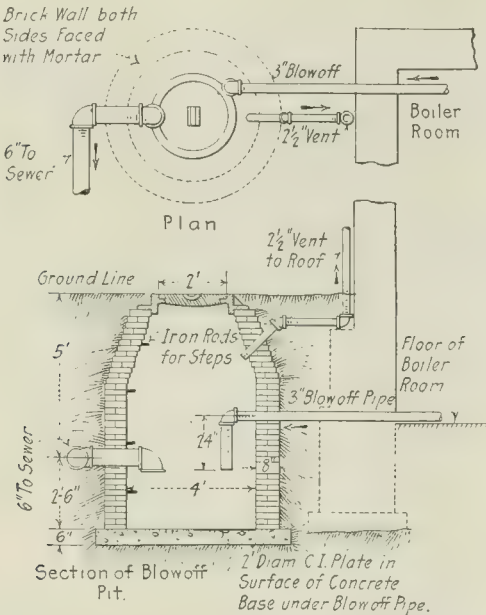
CONSTRUCTION DETAILS OF BLOW-OFF PIT
